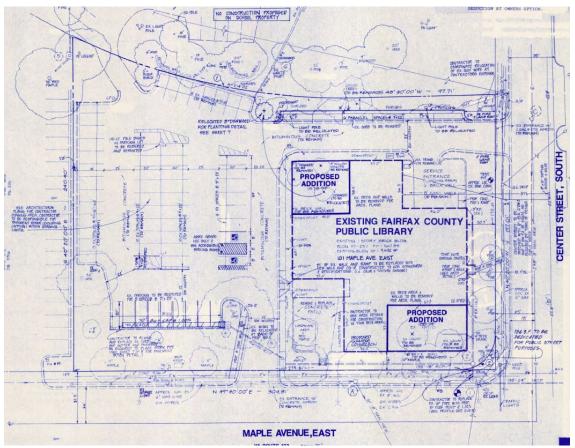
101 Maple Ave E – Patrick Henry Library - 1991 Layout Plan showing building additions; plan prepared by Walter L. Phillips, Inc.
